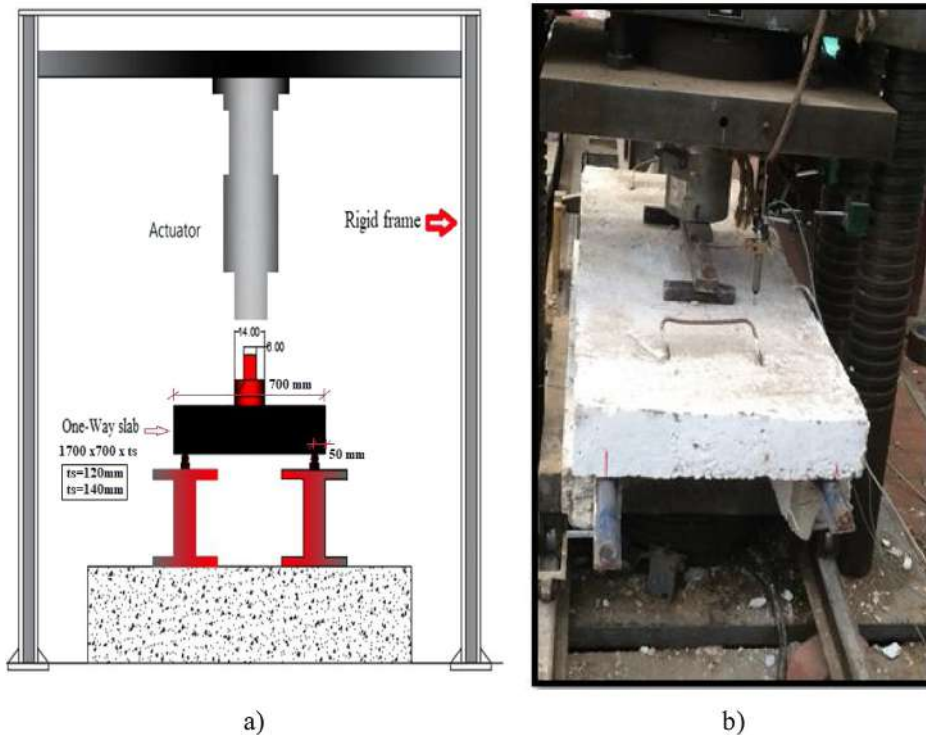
Specimens details; a) Specimens mold; b) flexural test set up.
